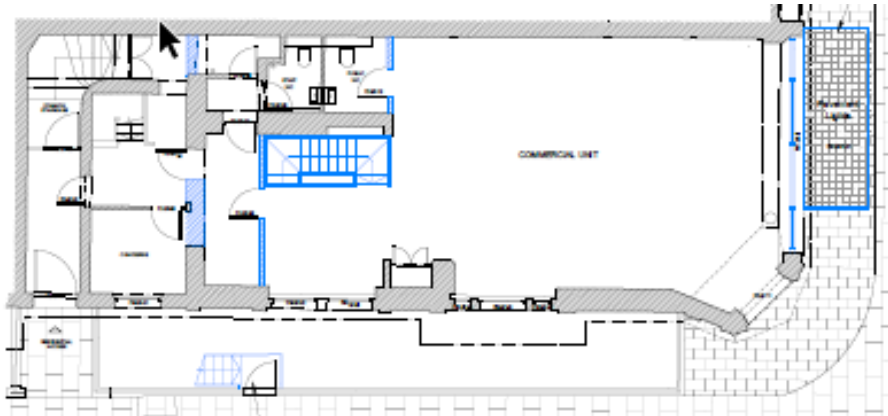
Proposed typical floor plan (1<sup>st</sup> floor)
